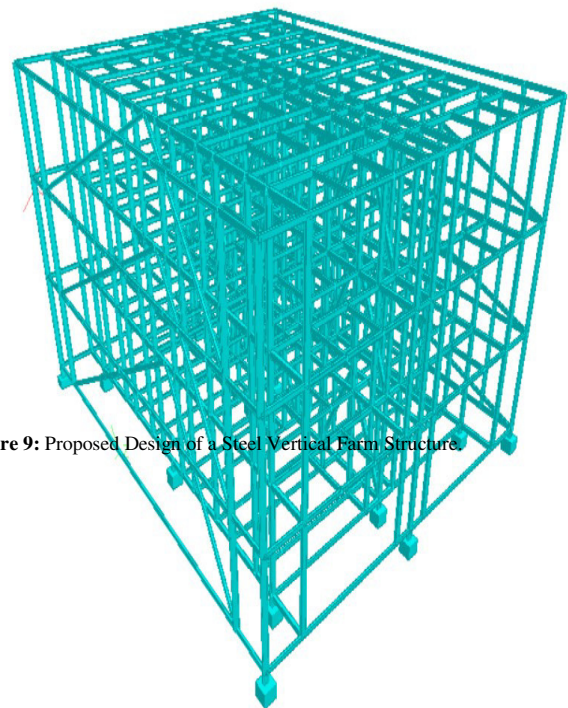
Proposed Design of a Steel Vertical Farm Structure.
